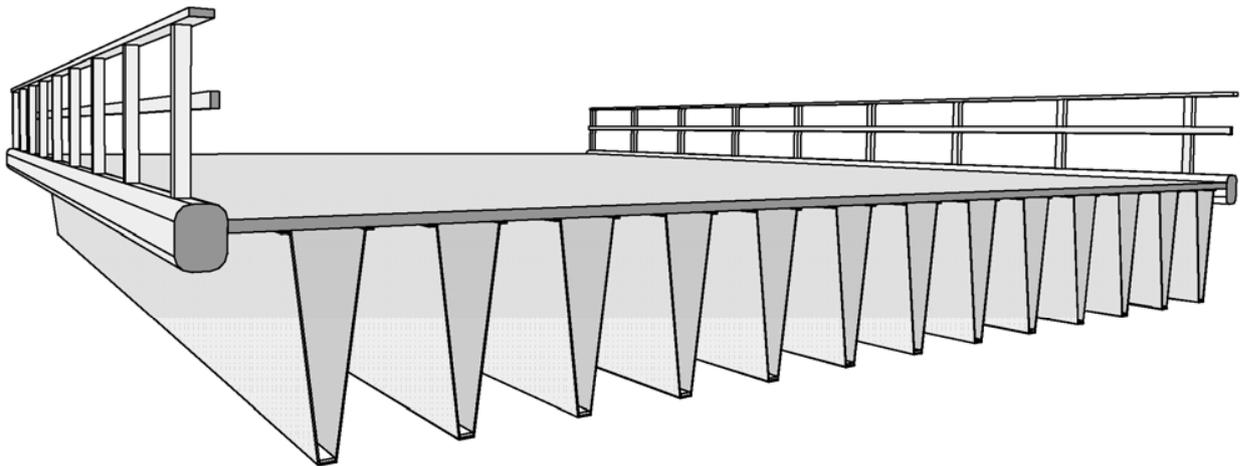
Outline of the i-bridge concept, a perspective sketch illustrating the major components of the bridge.
